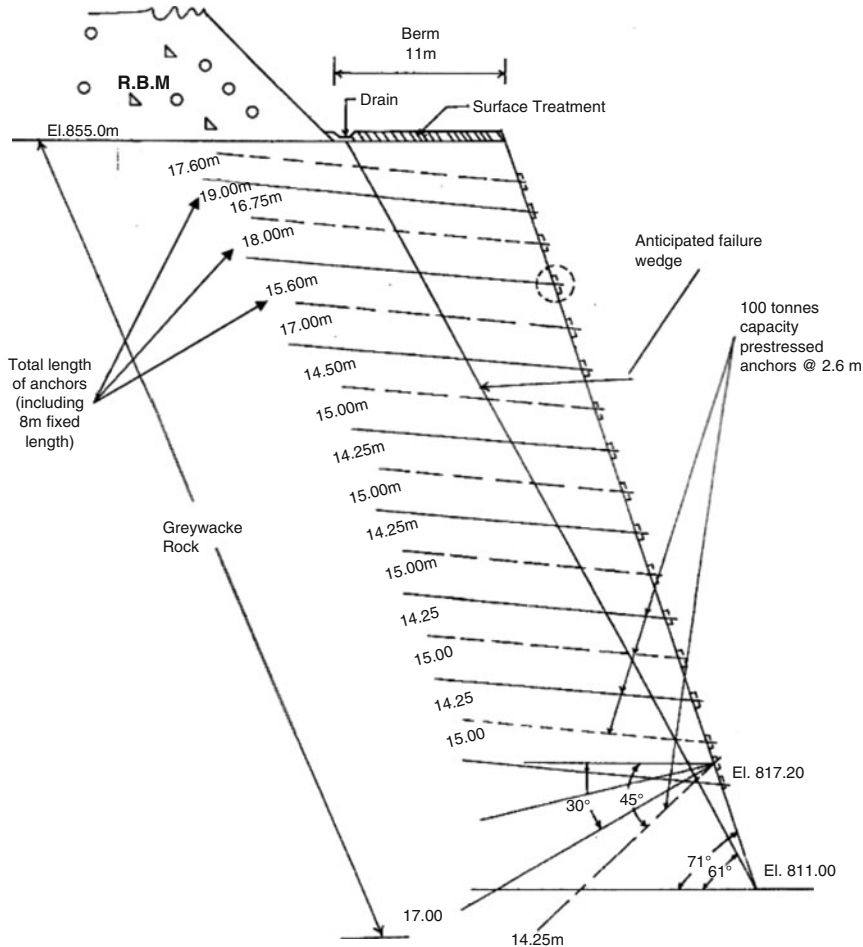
Section showing prestressed anchors (wedge failure case).
